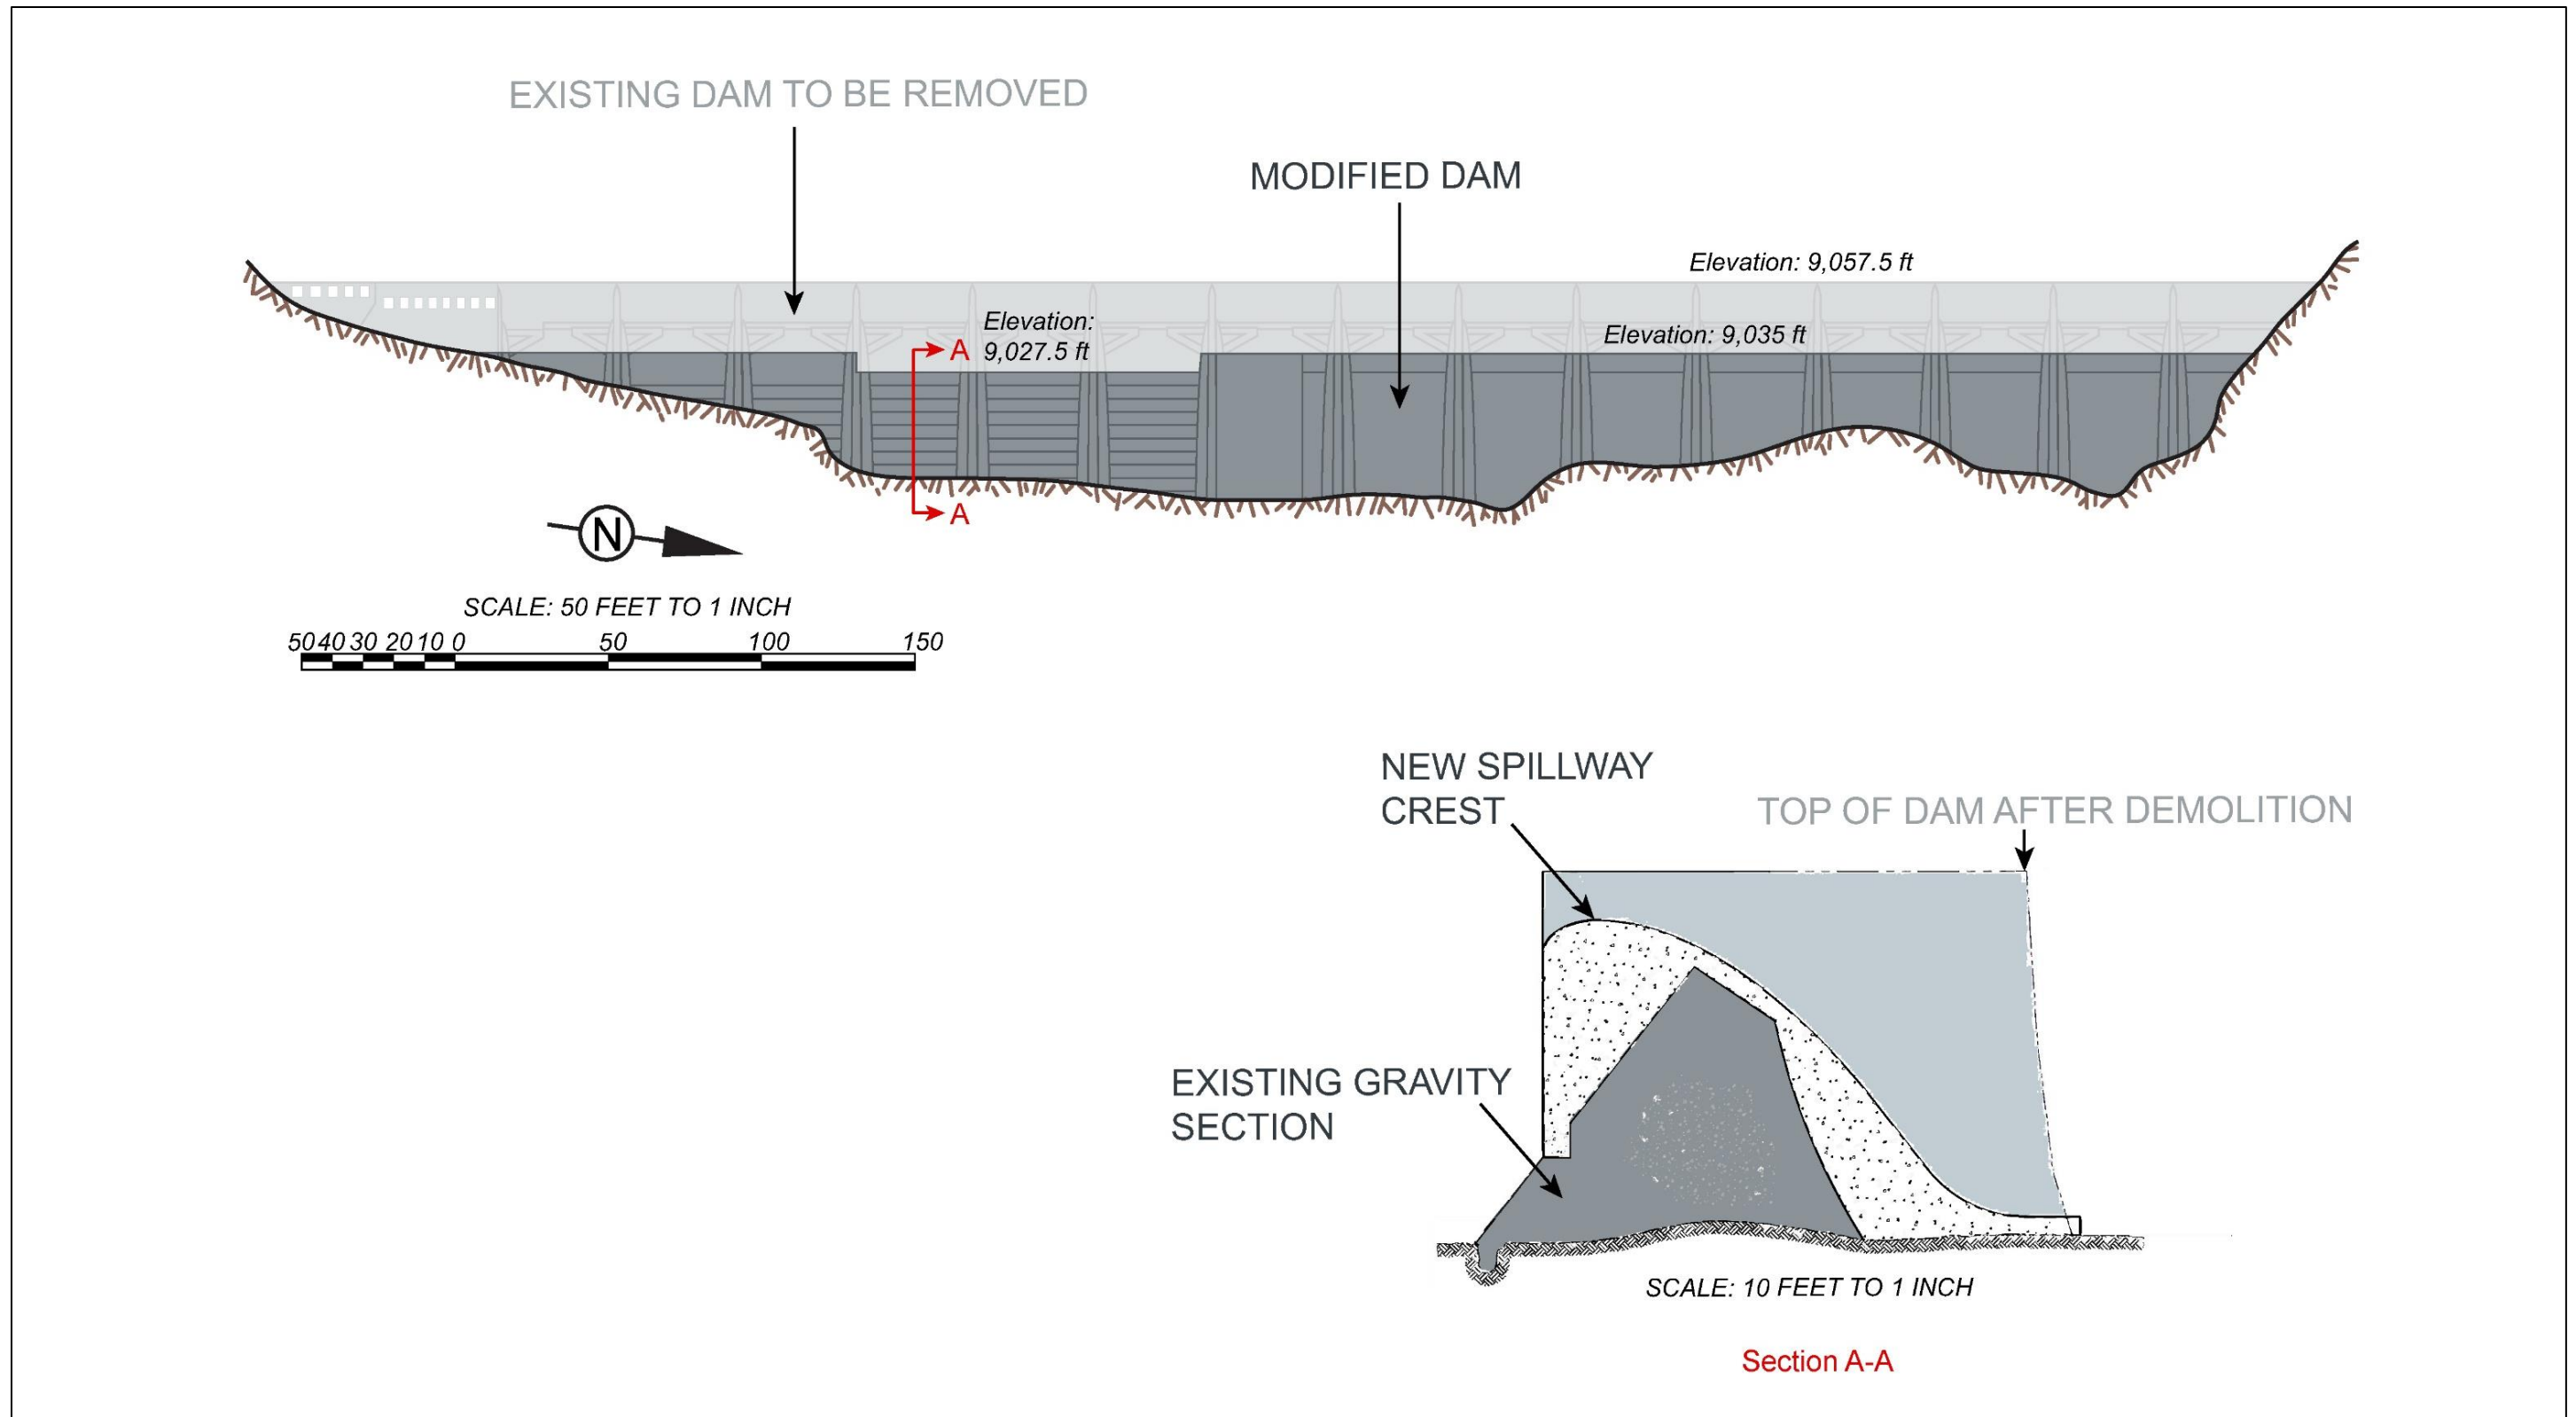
Cross Section of the Existing Gem Dam and Modified Dam Associated with the Gem Dam Retrofitting Alternative
